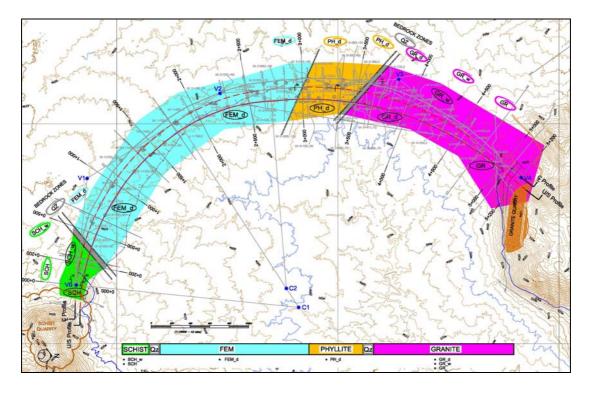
GERD project, saddle dam, GEOLOGICAL PLAN
